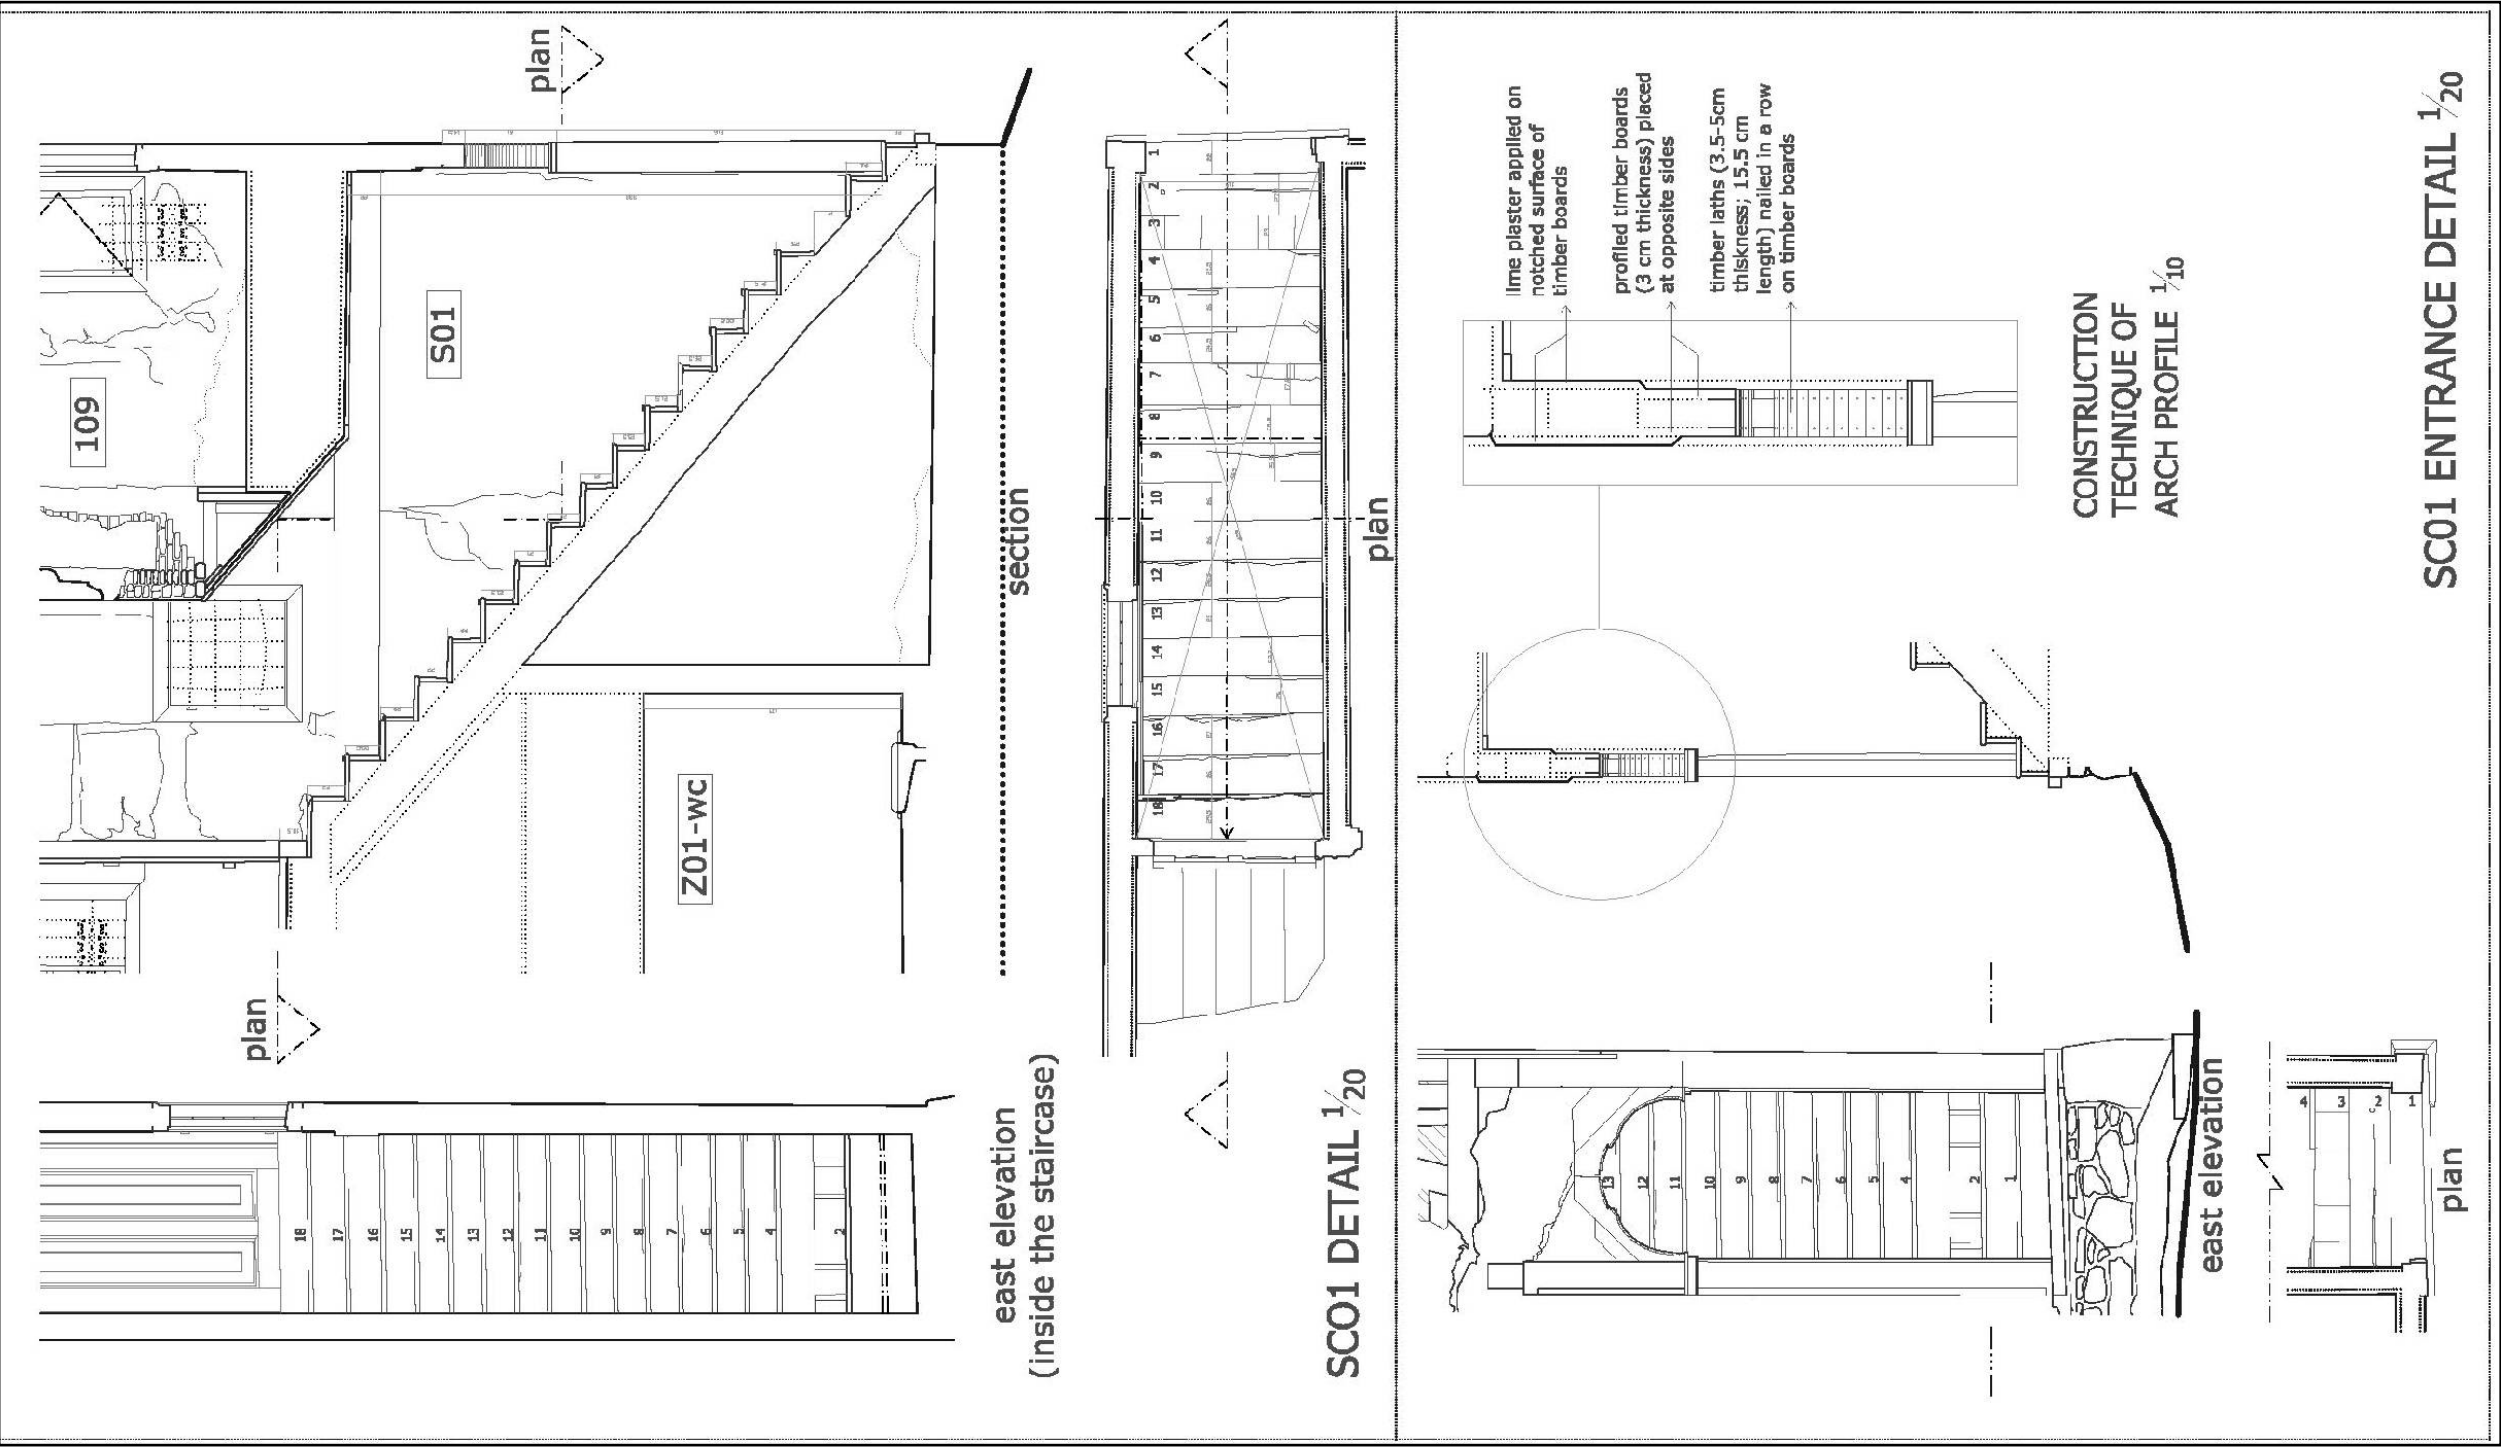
Details of Staircase and its Entrance: Scaled into 1/100 (presented in 1/20 at Jury)
